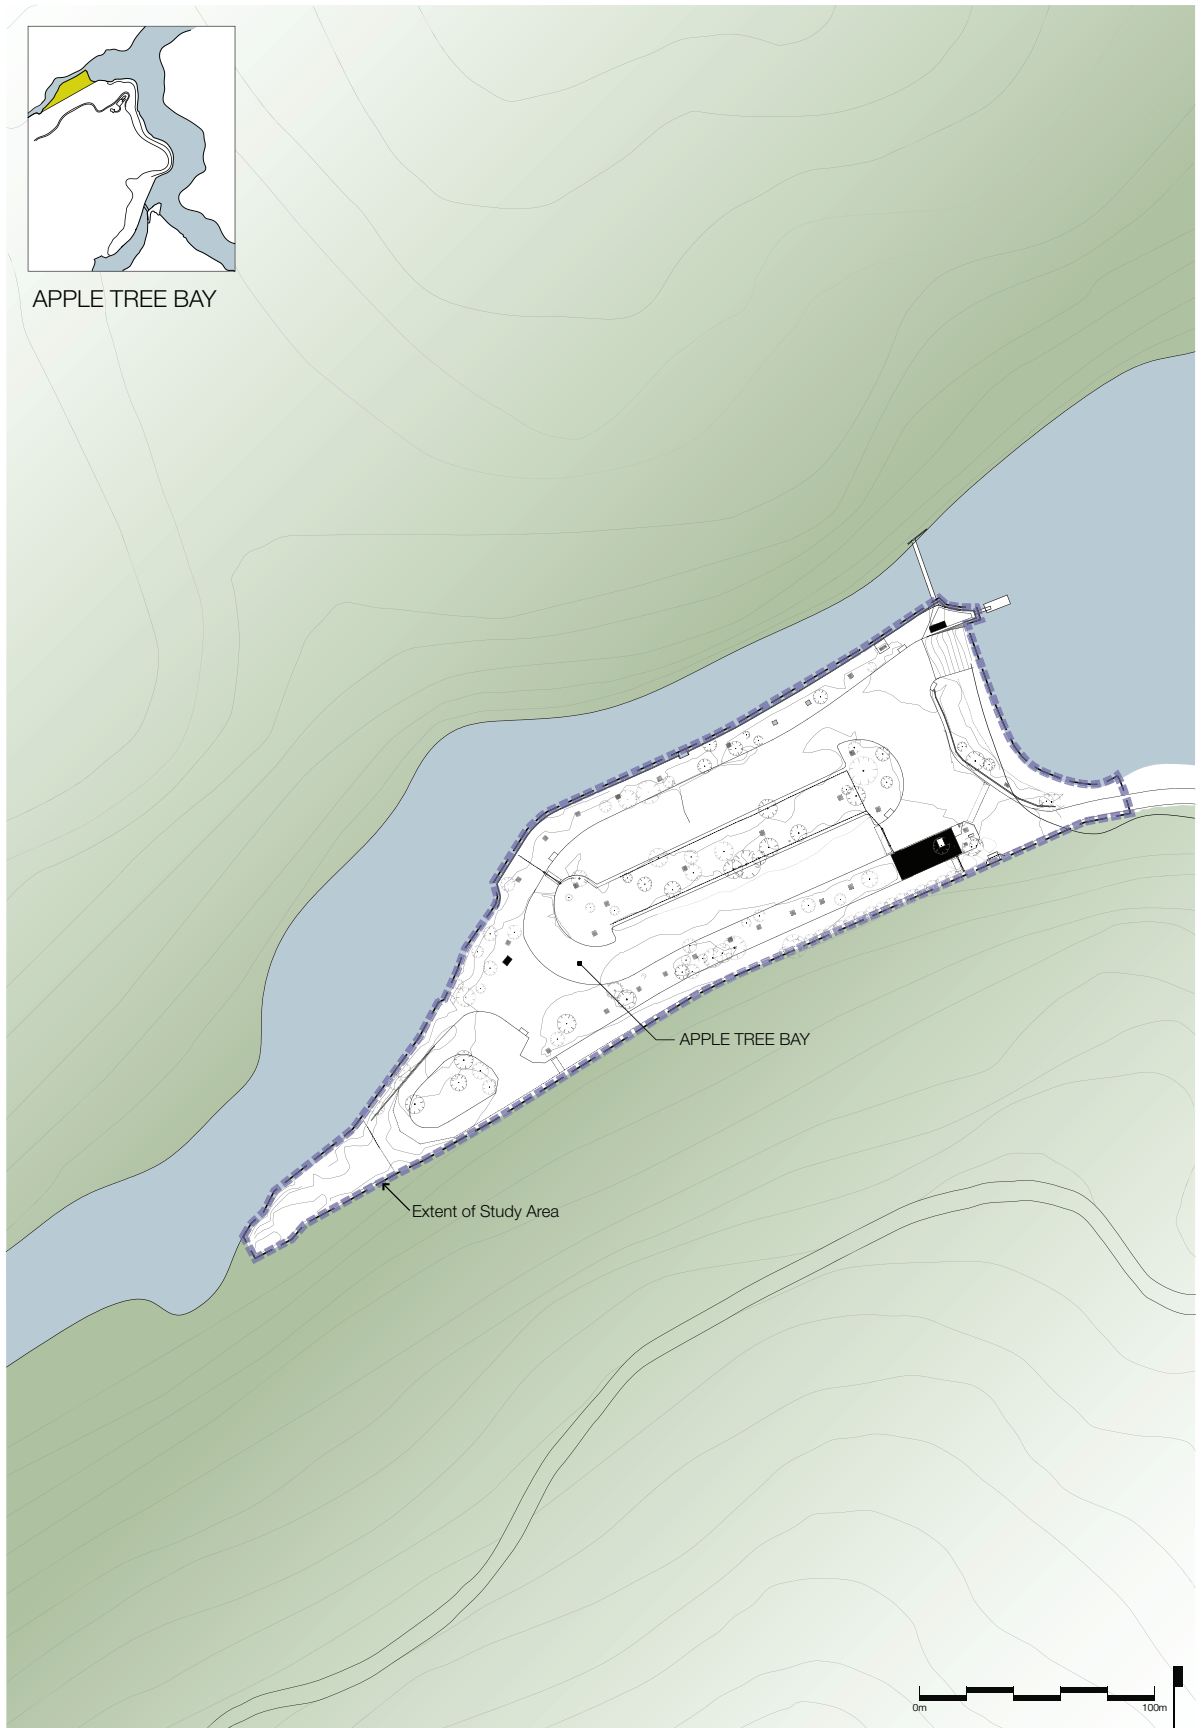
Precinct Plan of Apple Tree Bay (as existing)
